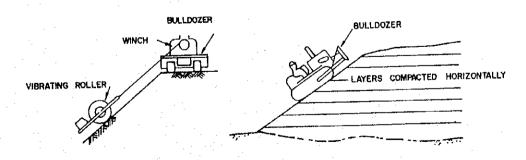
Slope Compaction with Vibrating Roller & Bulldozer
